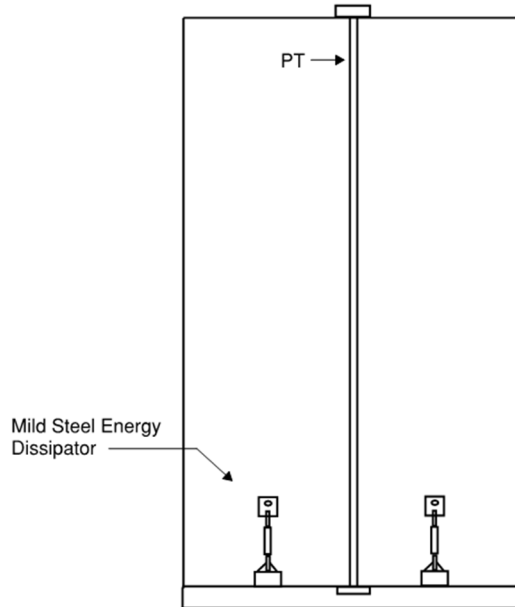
Mild Steel Energy Dissipator in a PT Rocking Timber Wall
